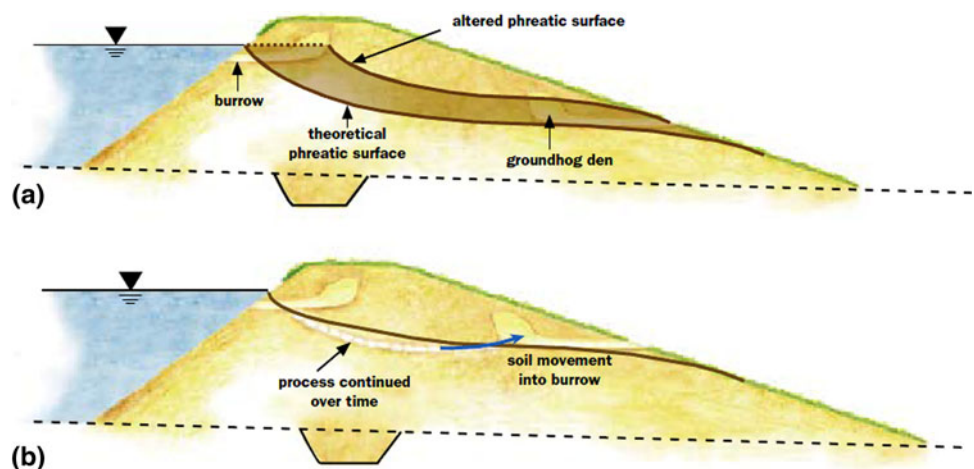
Hydraulic alternations due to animal burrows: (a) shortening seepage path; (b) piping [1]
